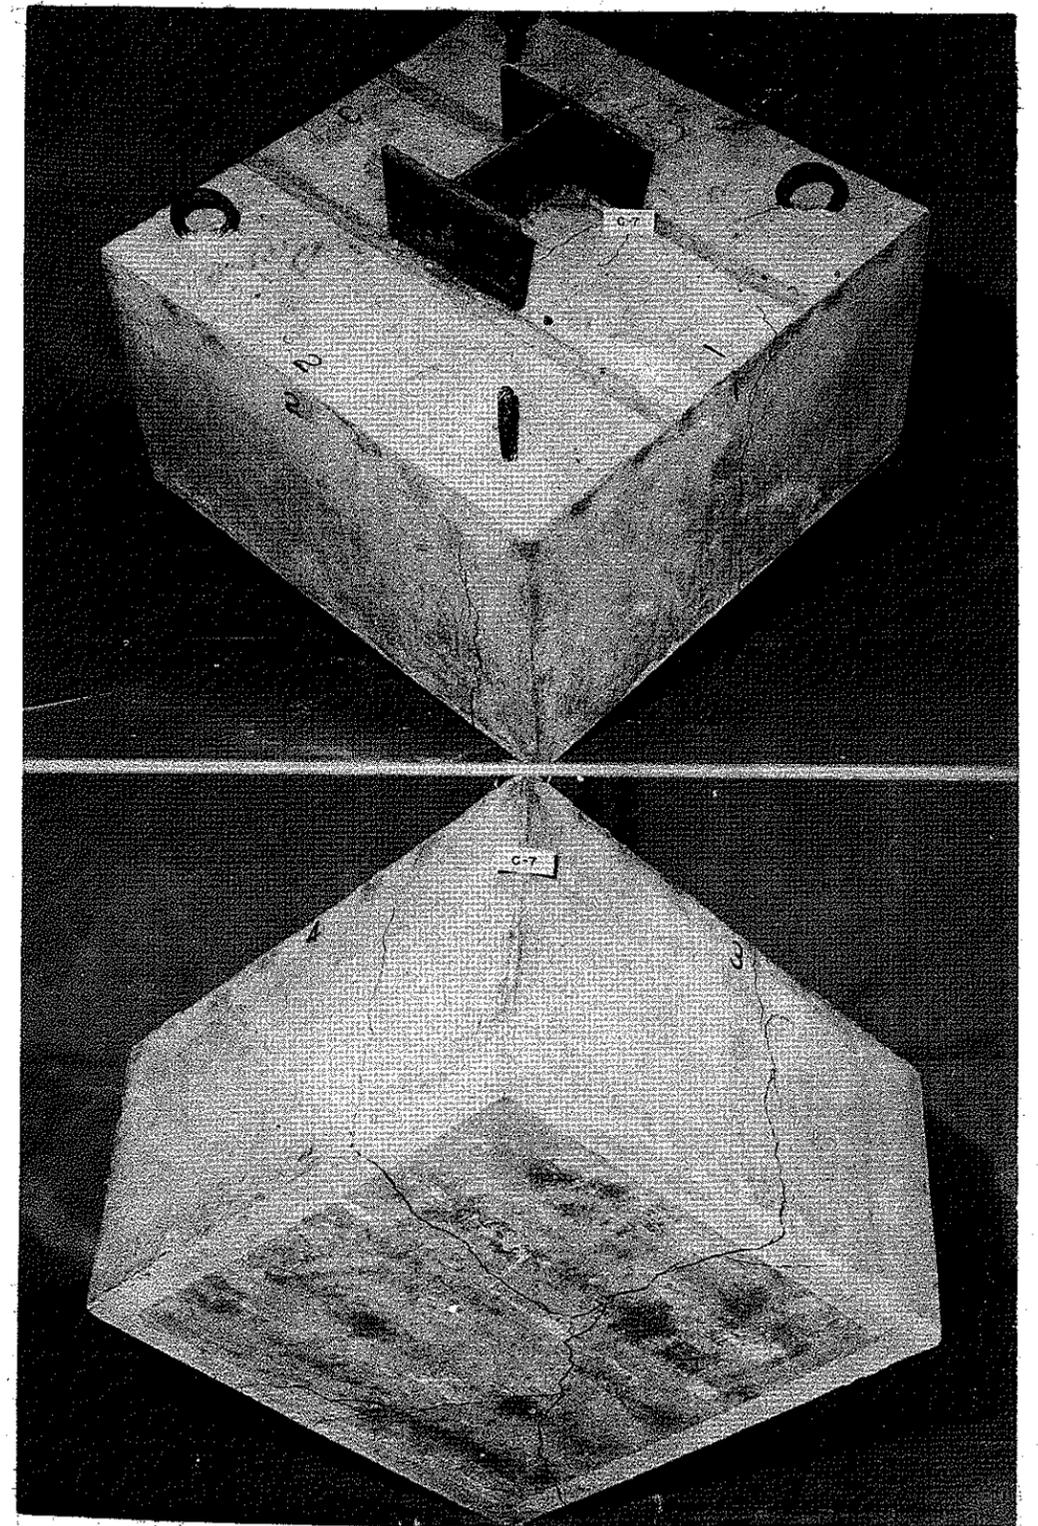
APPEARANCE OF SPECIMEN C-7 AFTER TESTING.
